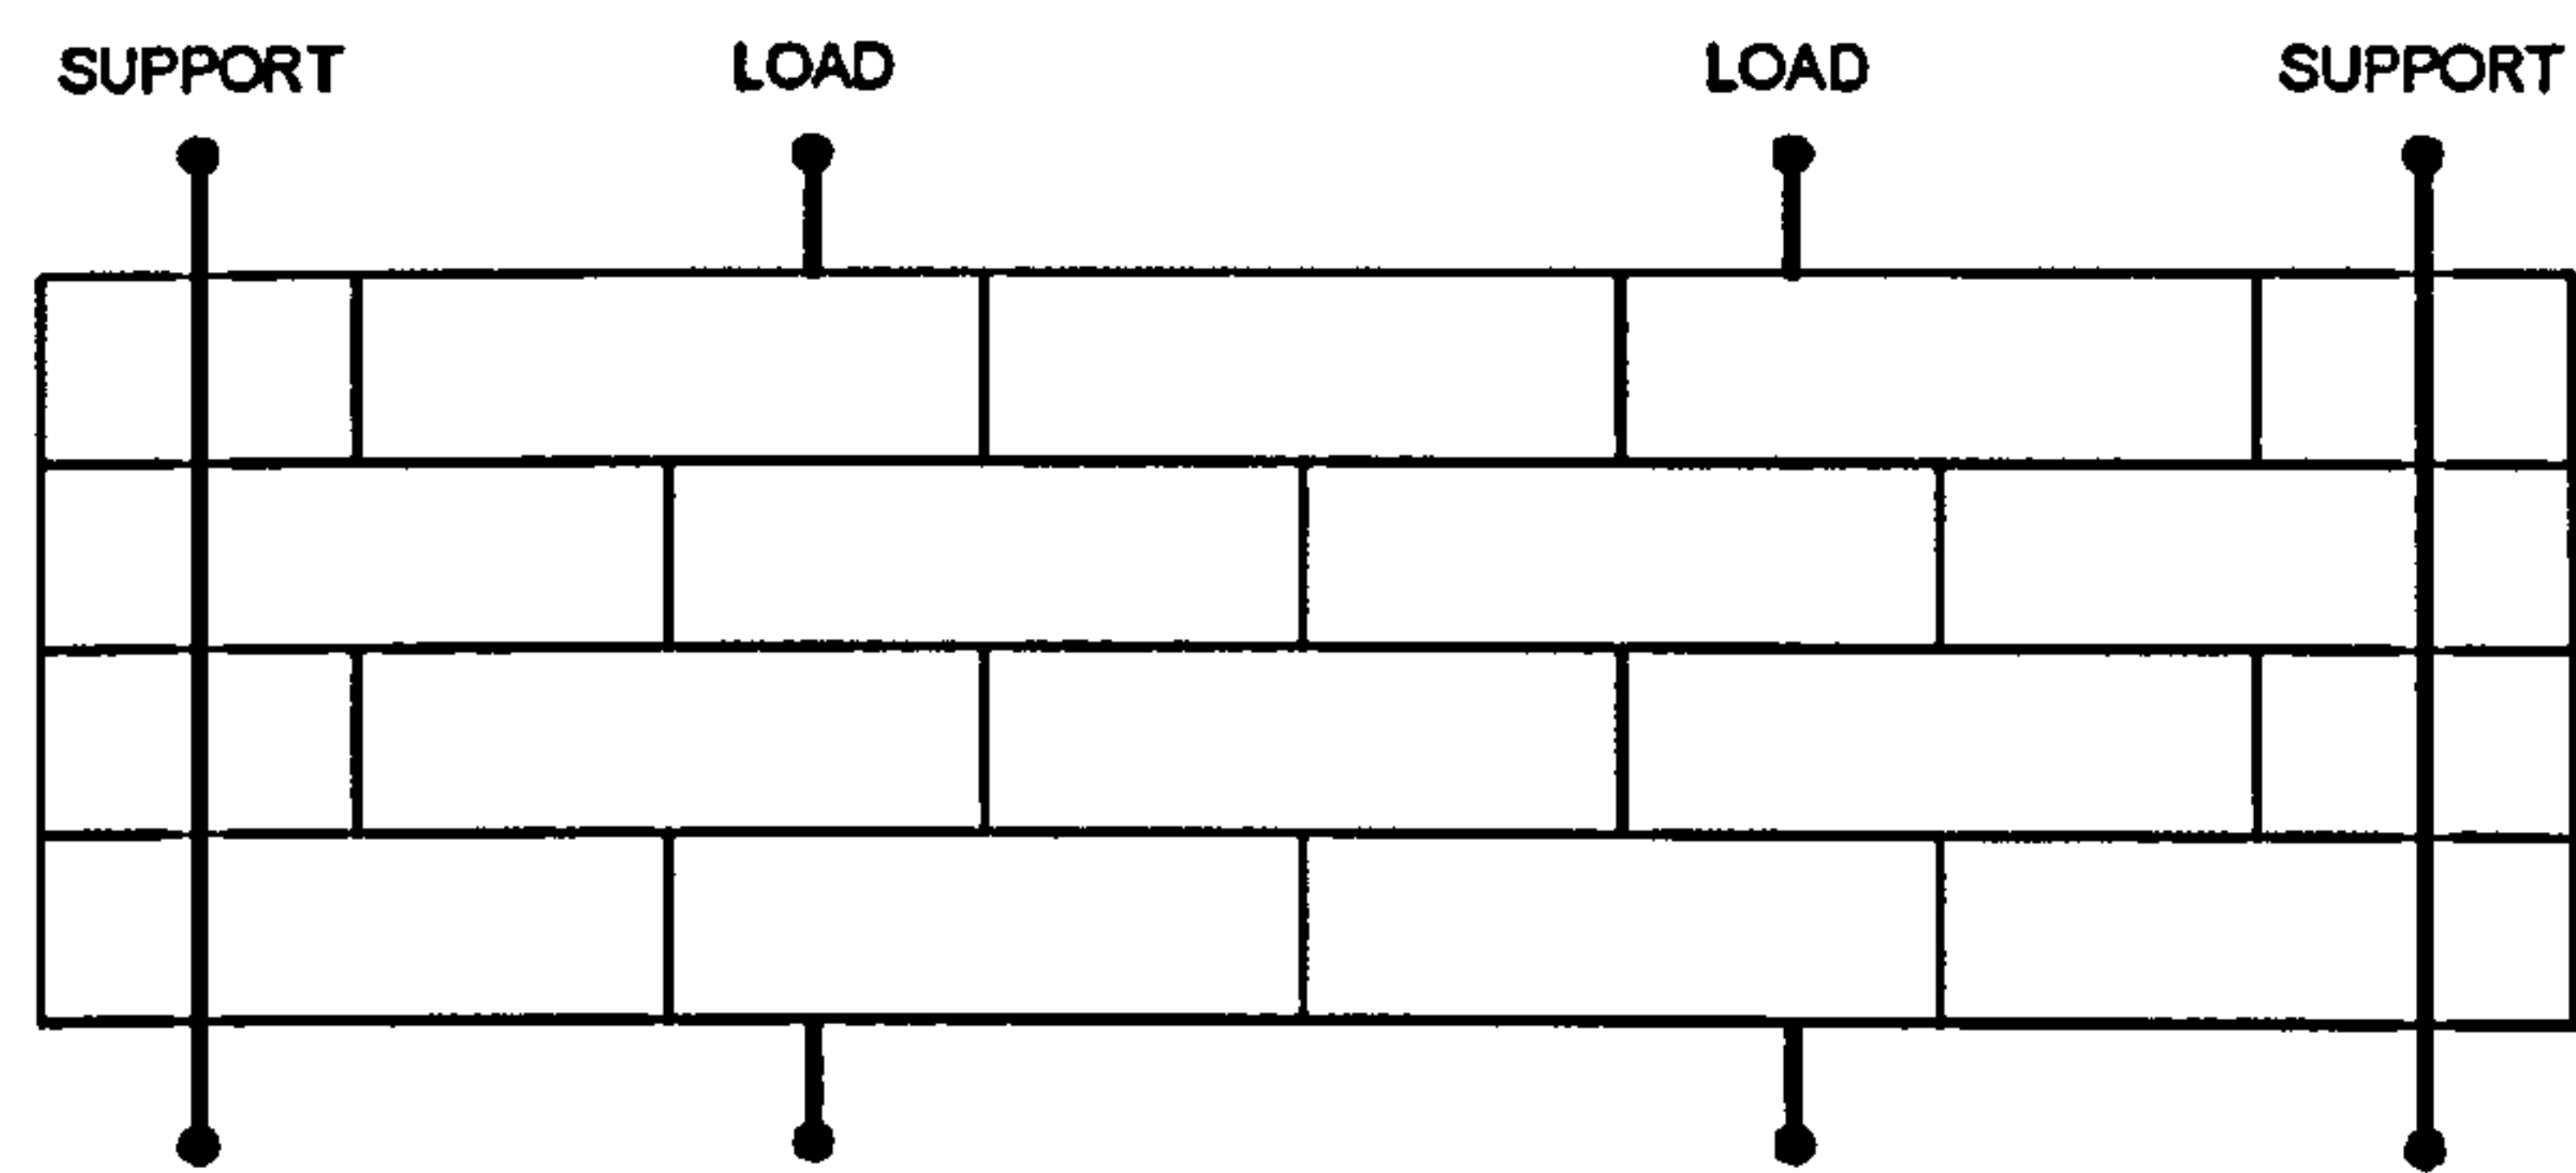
P wallettes - Identification of support and load bars
